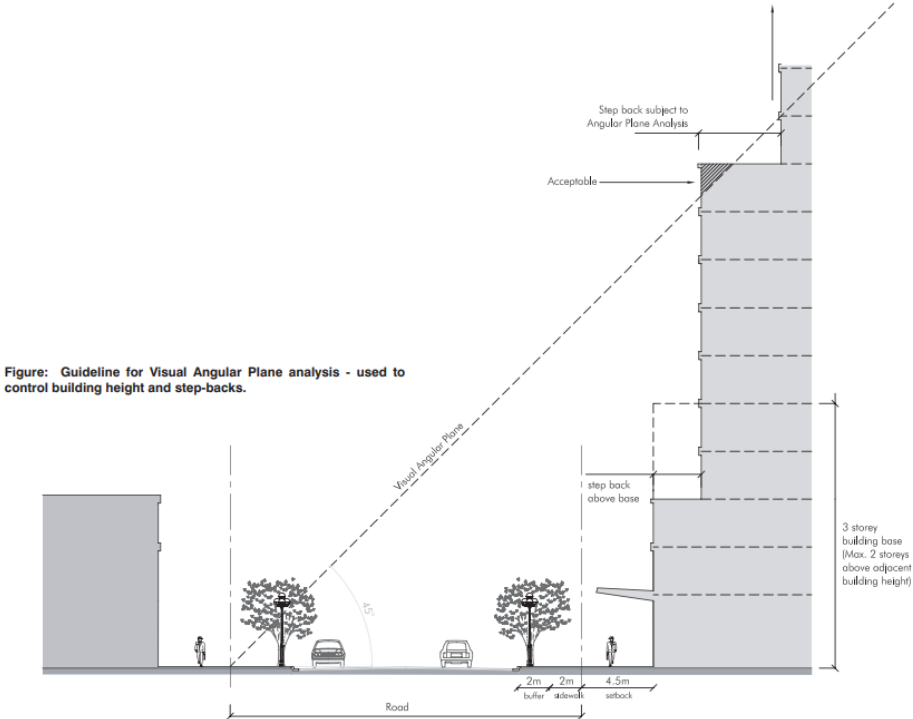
4A.6 RESIDENTIAL BUILDING HEIGHT
